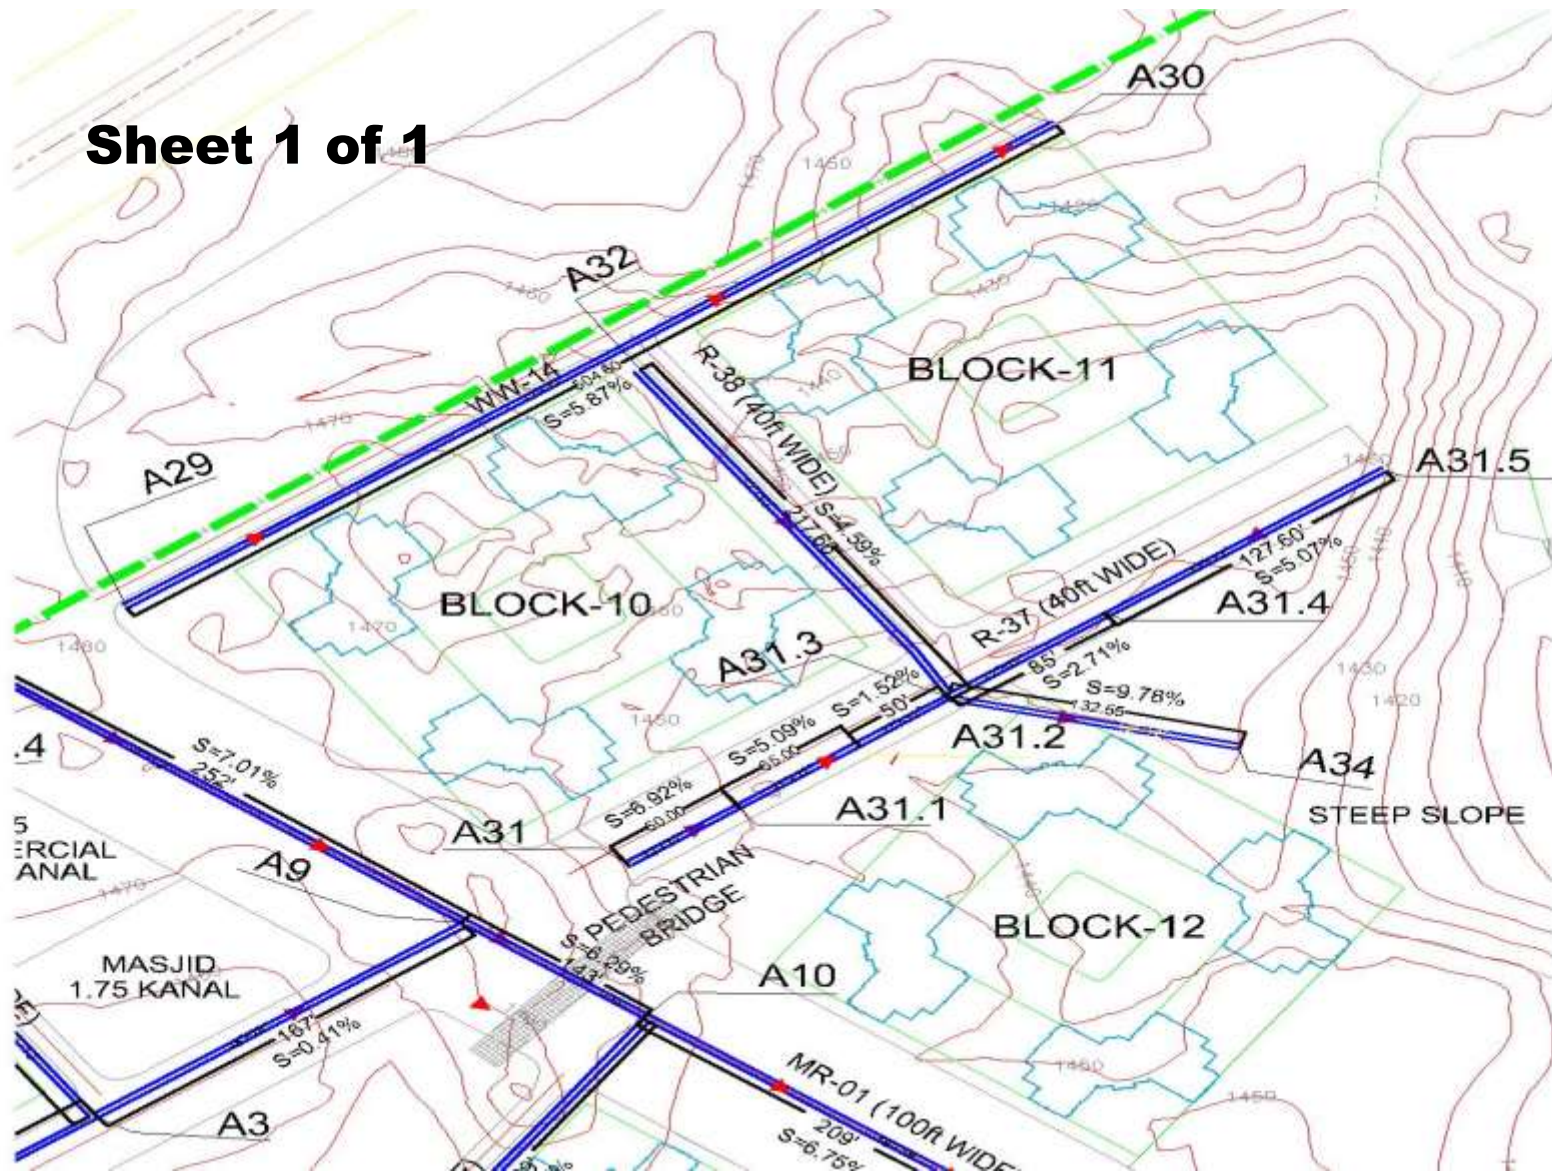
Storm drainage layout plan of Sub-catchment-10, 11 showing final disposal nodes A30 & A34
